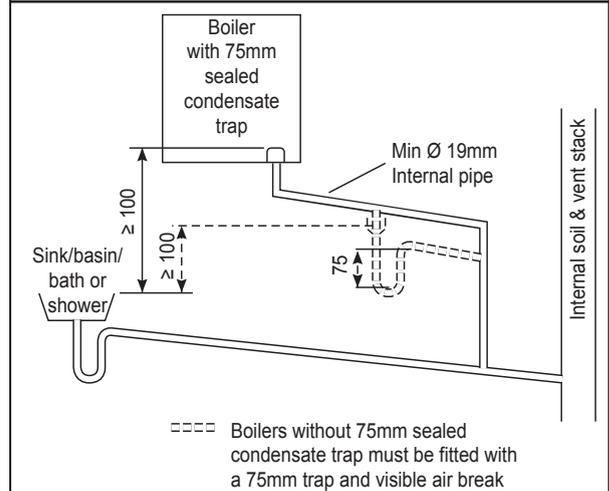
Connection of a Condensate Drainage Pipe Downstream of a Sink, Basin, Bath or Shower Water Trap to Internal Soil Vent Stack
